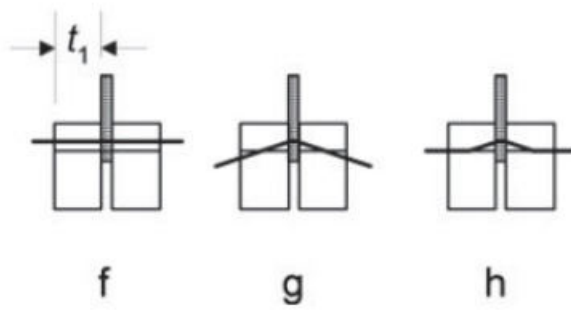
Failure modes for the slotted-in plate in the truss elements.
